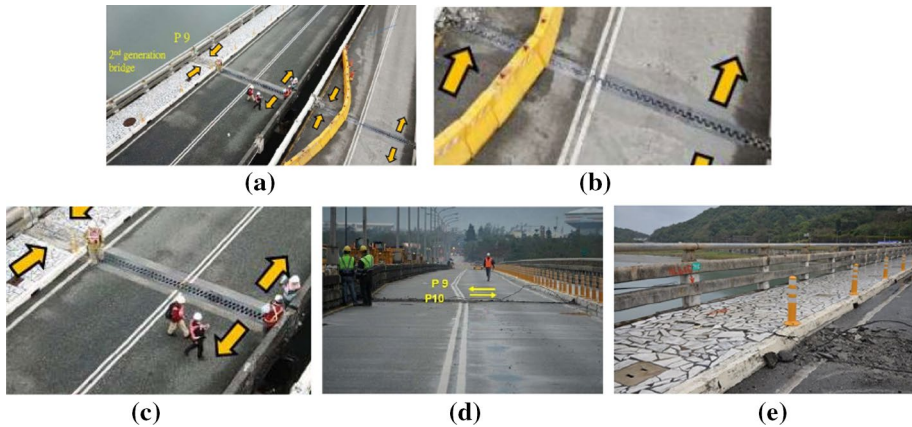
a Expansion joints at pier P9. b, c Magnifications of a. d Deflected white traffic markings between piers P9 and P10. e Shattered bridge deck at pier P10
